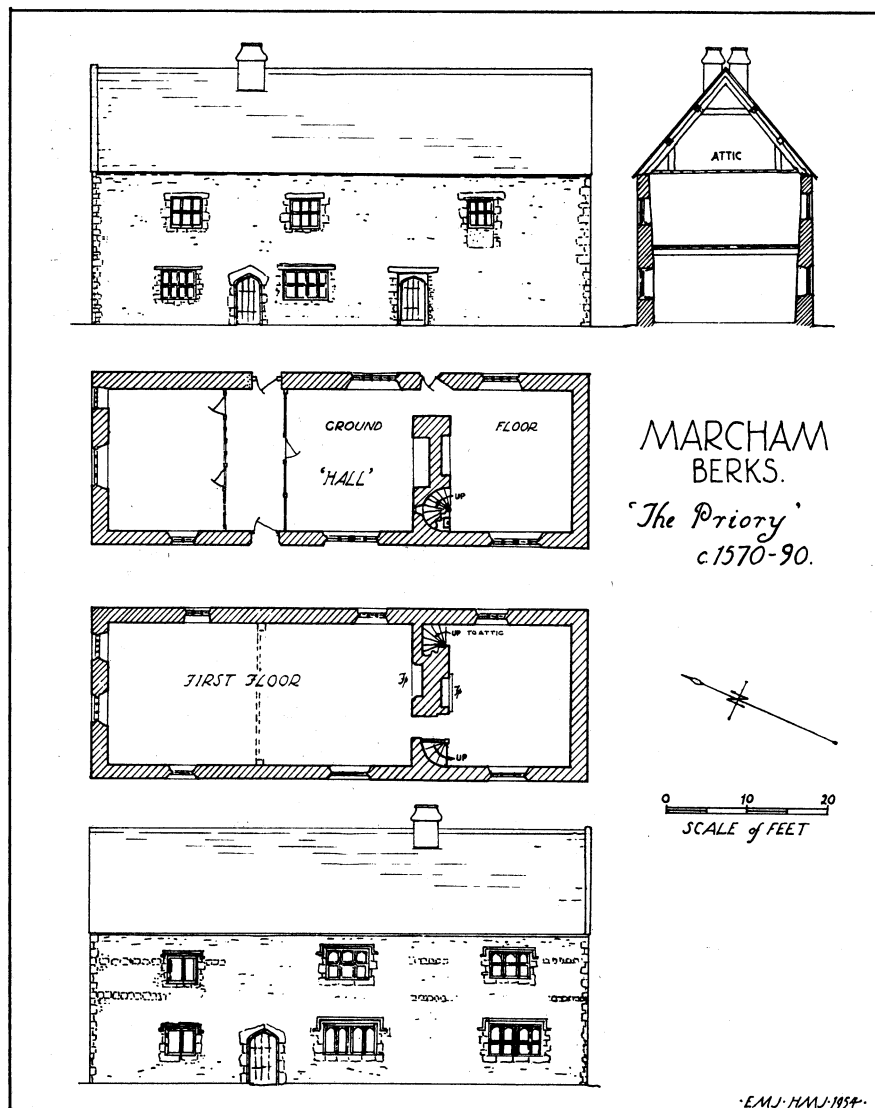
The 'Priory', Marcham: plans, section and elevations.
